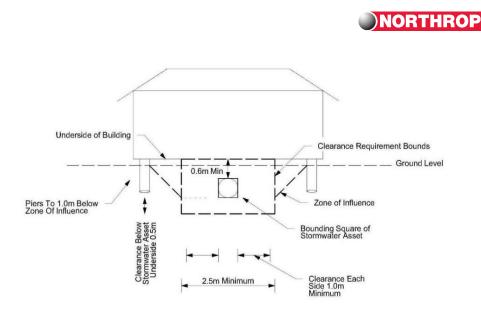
Building OVER a Sydney Water stormwater asset requirement
